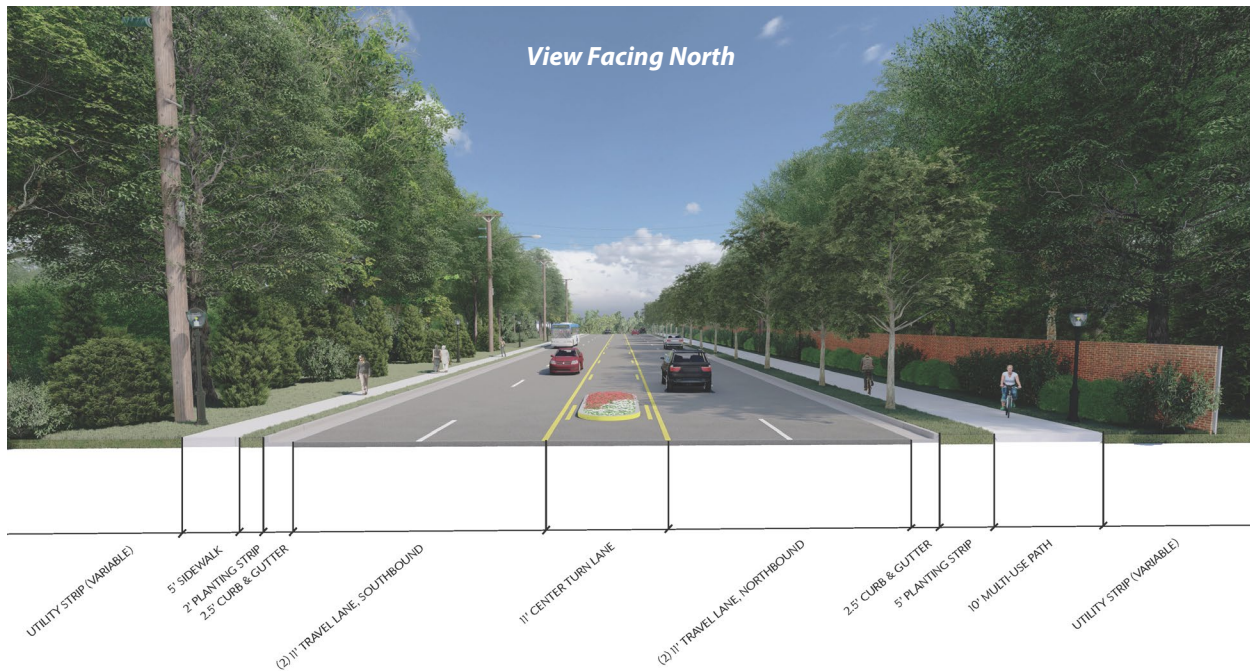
RECOMMENDED TYPICAL CROSS-SECTION FOR SEGMENT 1
